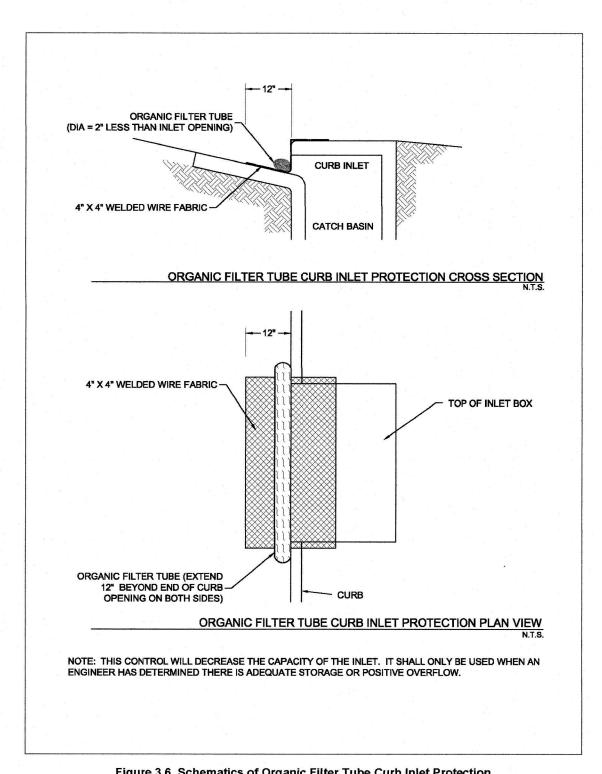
Schematics of Organic Filter Tube Curb Inlet Protection (Source: Modified from City of Plano BMP SP-4)
